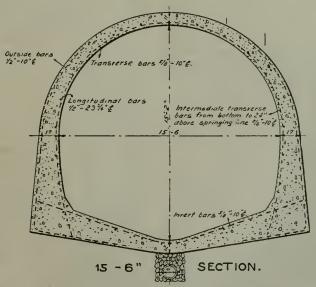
REINFORCED CONCRETE SEWER, LOUISVILLE, KY.
